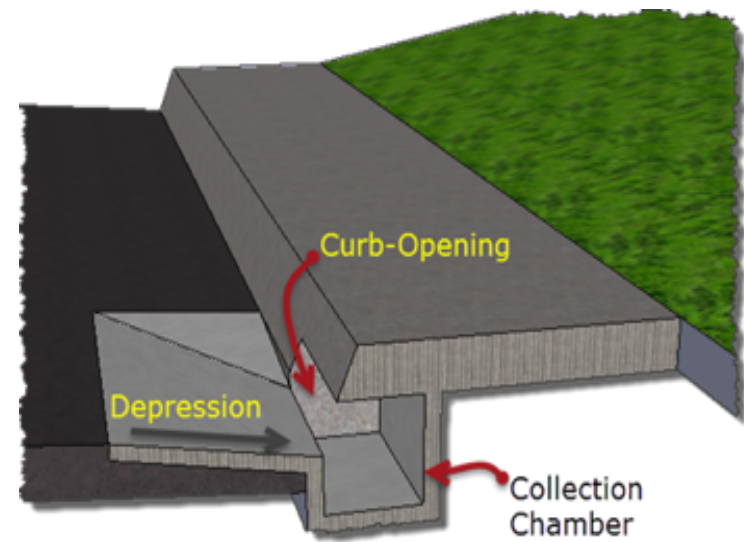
Stormwater Collection Design (Source: <http://www.hidrasoftware.com/en/types-of-drain-inlets-for-stormwater-collection-available-in-dren-urba/>)
